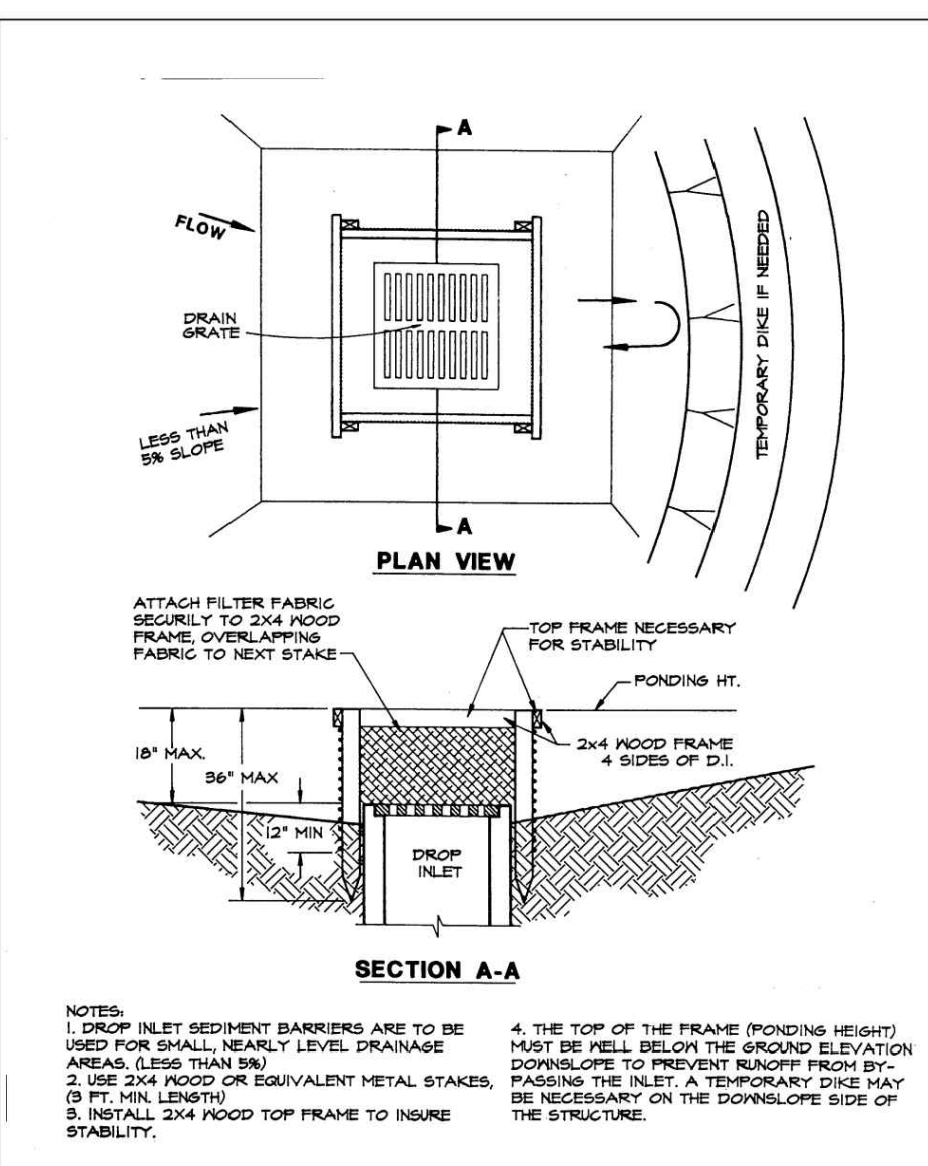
Silt Fence Drop Inlet Sediment Barrier
